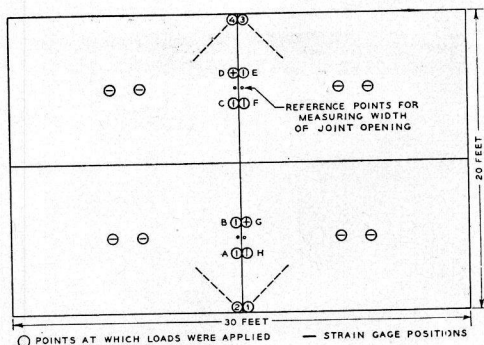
Plan of a 20-by-30-ft. test section, showing points at which loads were applied and strains measured.
